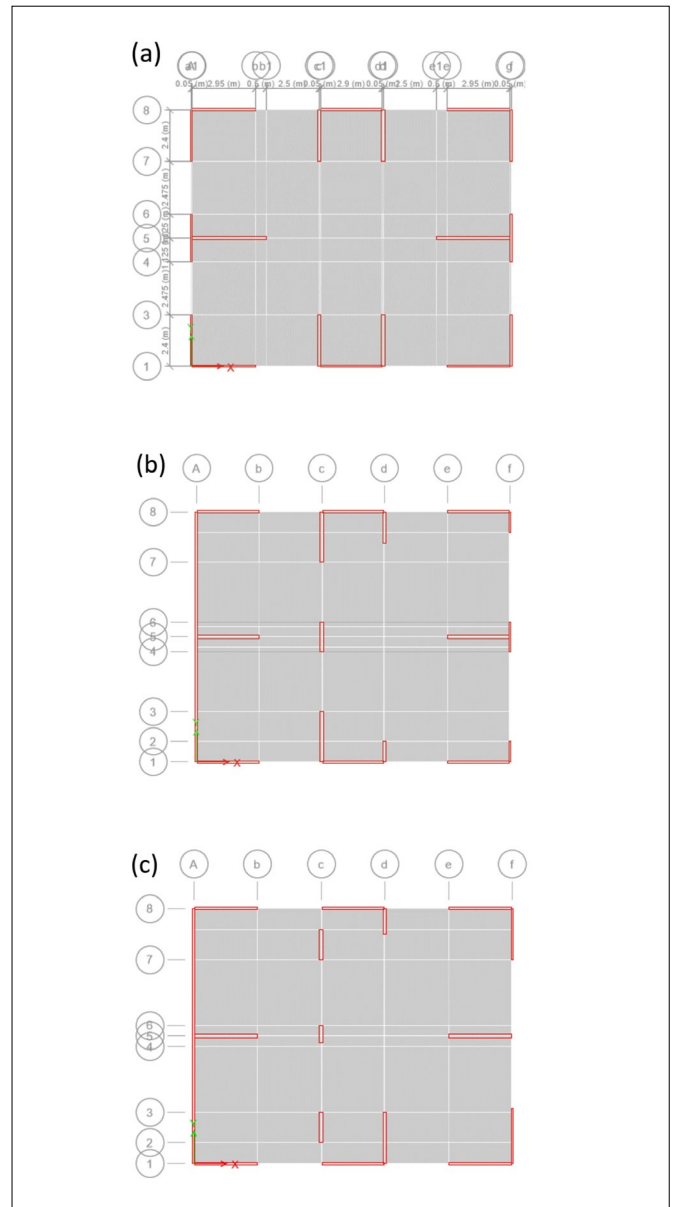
Floor plans of single-storey rectangular case study houses [67]: (a) regular bracing arrangement; (b) 50% irregularity in bracing arrangement; and (c) 100% irregularity.
